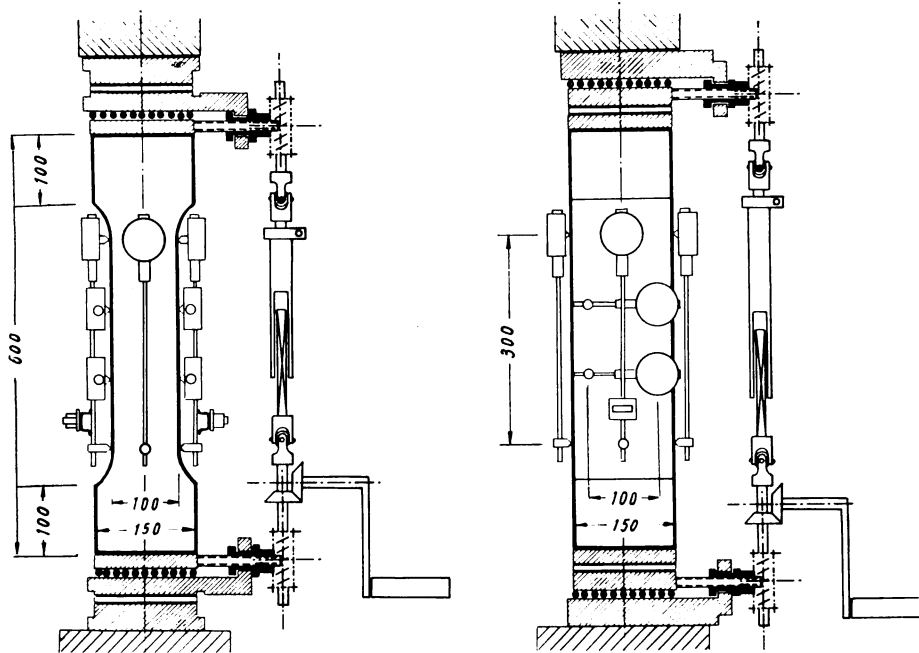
Test arrangement and centering device (dimensions in millimeters).
